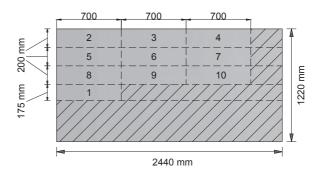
Cutting plan for risers from a sheet of 12 mm thick plywood.
